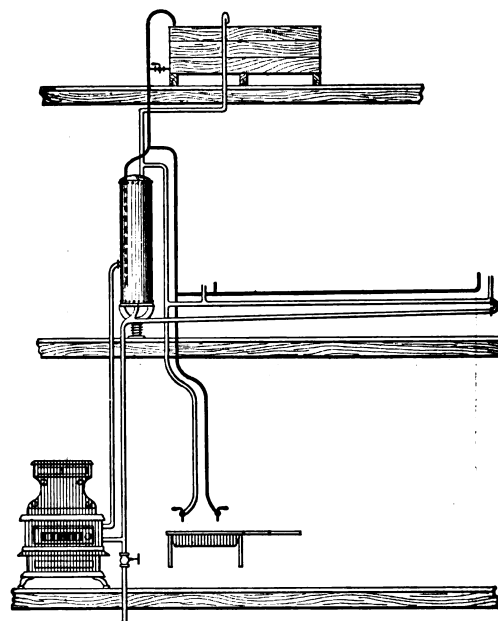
Tank Supply and Boiler Heating Bathroom.
